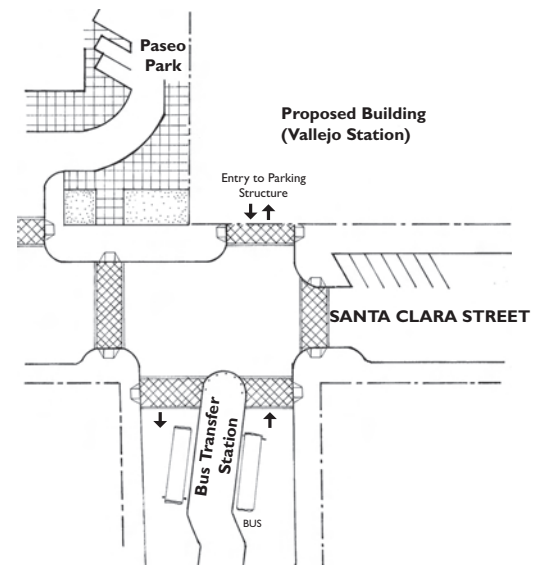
C.35: Concept Plan of Reconfigured Santa Clara Street Transit Center
